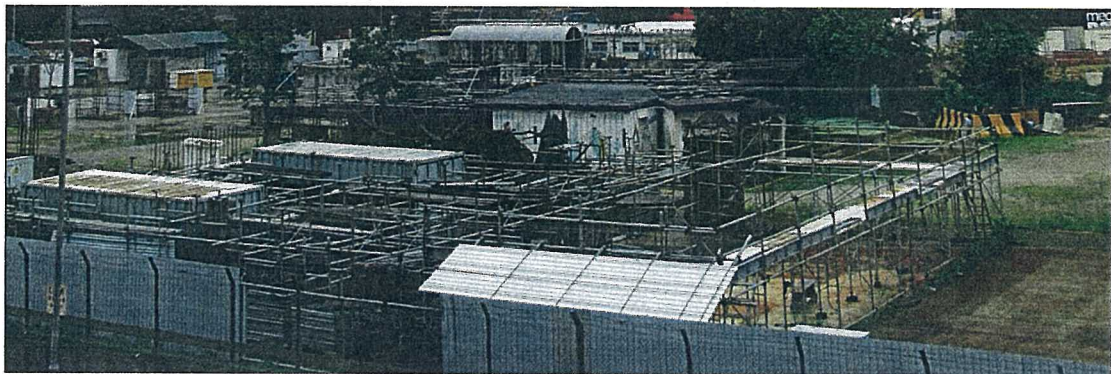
Views of CICTA Sheung Yuet Road Training Ground (a ventilation pocket)
